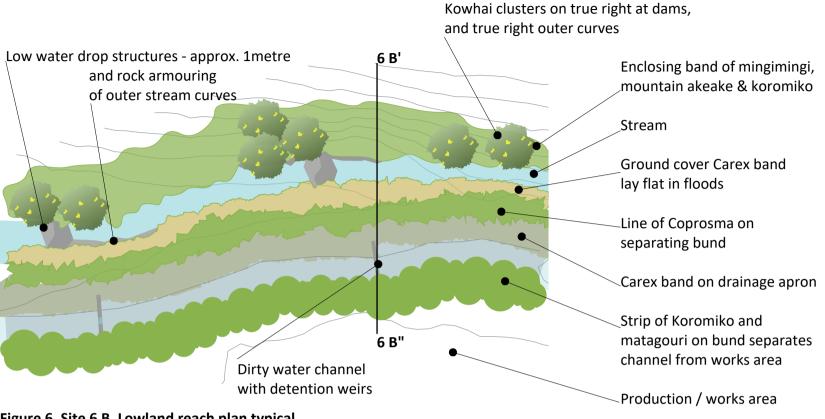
, Site 6 B, Lowland reach plan typical, 1:300 @ A3
